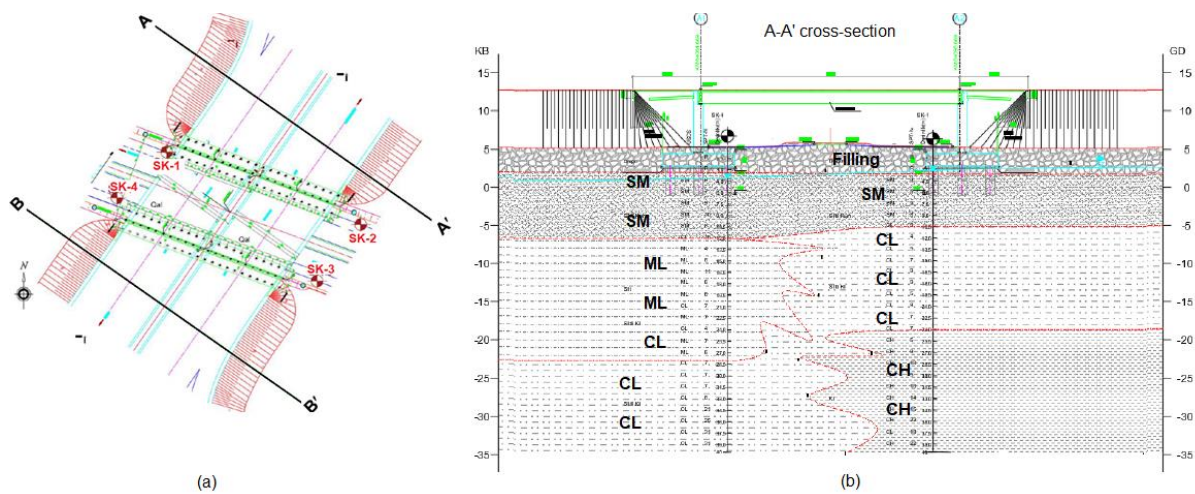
(a) Bridge plan view and SK-1, SK-2, SK-3 and SK-4 drilling locations (b) Cross-section view of the bridge project
